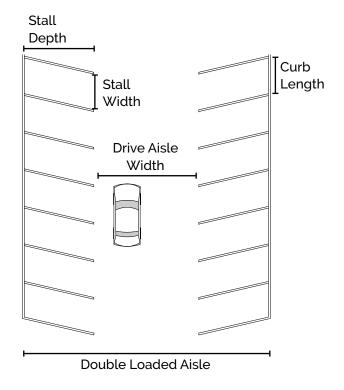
Parking Space and Drive Aisle Dimensions.
